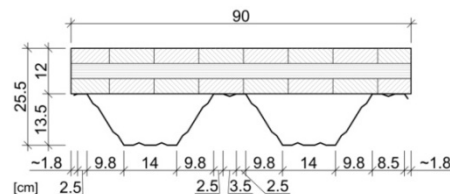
Dimensions of the cross section of the version I of timber-steel composite plates (138)
